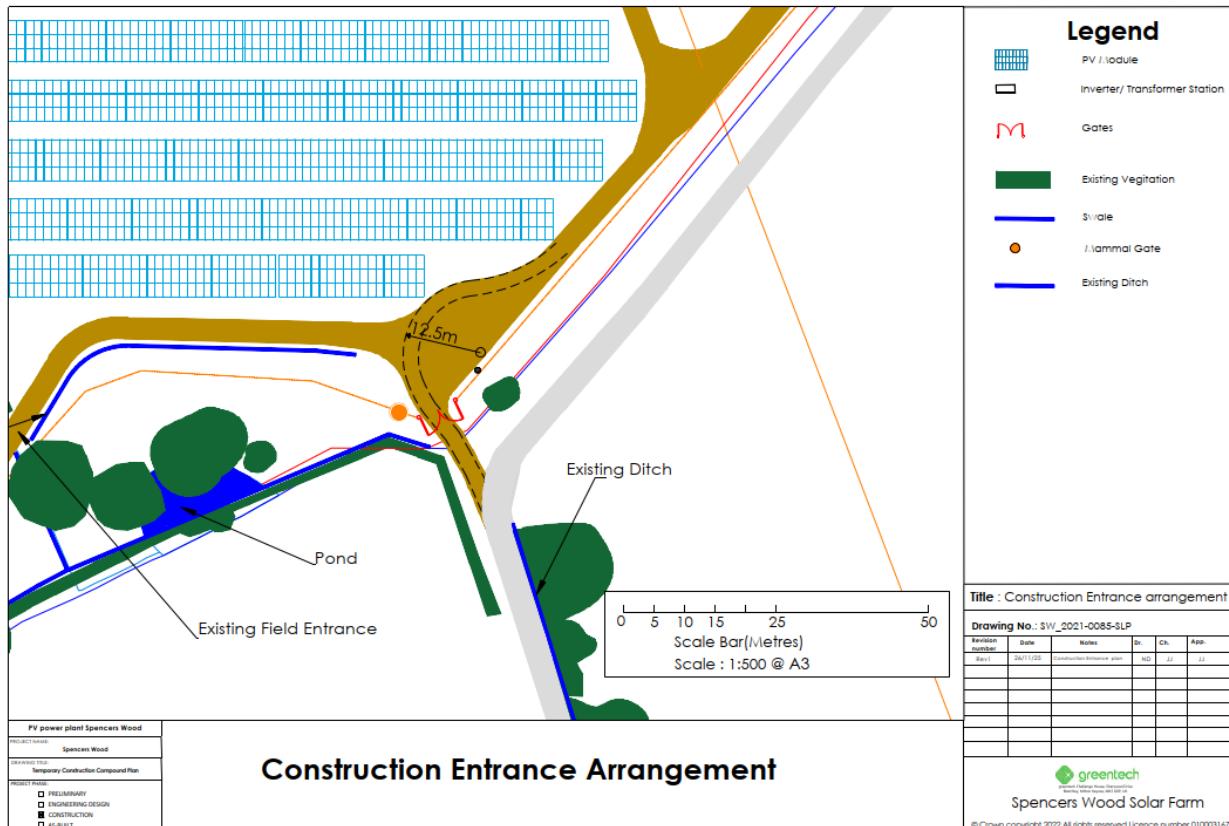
The construction entrance to the site demonstrating manoeuvring for a 16.5 metre HGV.
